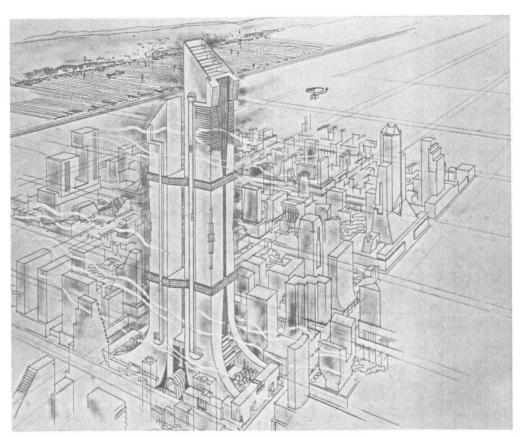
Author's study for the World's Tallest Building (1981) shows the skyconcourse at every 40 floors.
